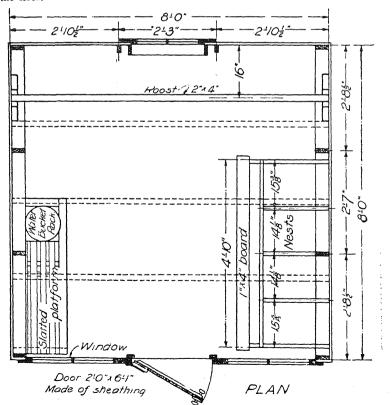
Floor plan of house shown in Fig 10 when used for laying hen .
